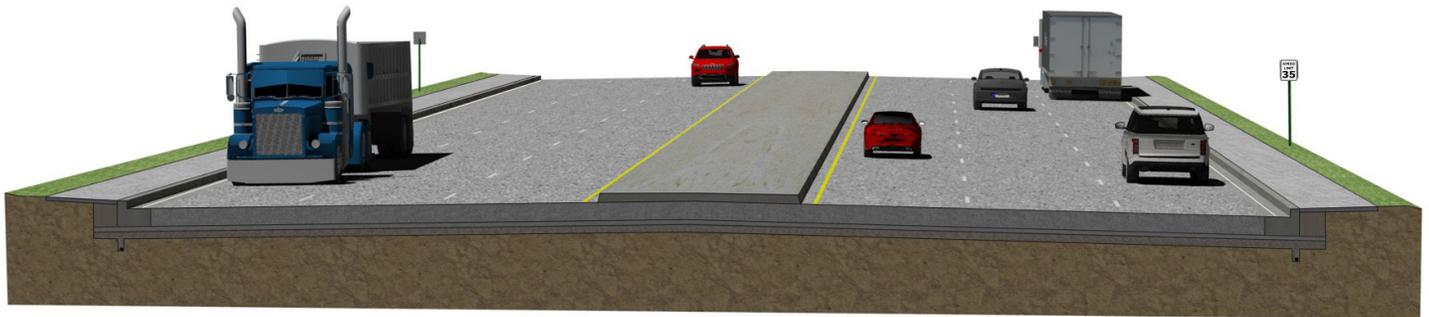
OPTION 1 - CONSTRUCTION OF 6-LANE CURB & GUTTER WITH RAISED MEDIAN.
